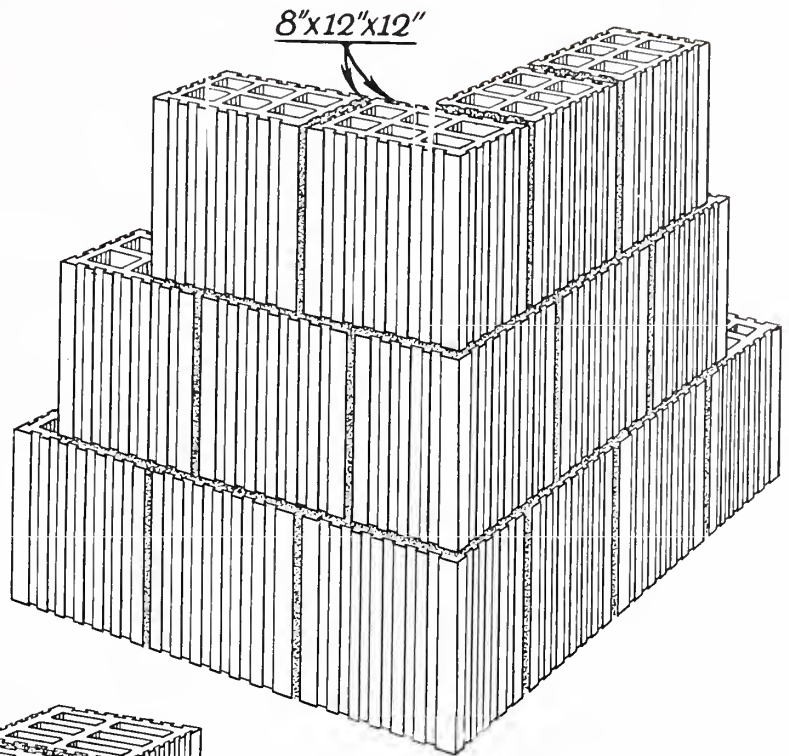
Showing method of laying eight-inch load bearing wall of 8"x12"x12" load bearing tile laid with cells vertical. 8"x12"x12" tile as corner block provides 8"-4" break in joints.
